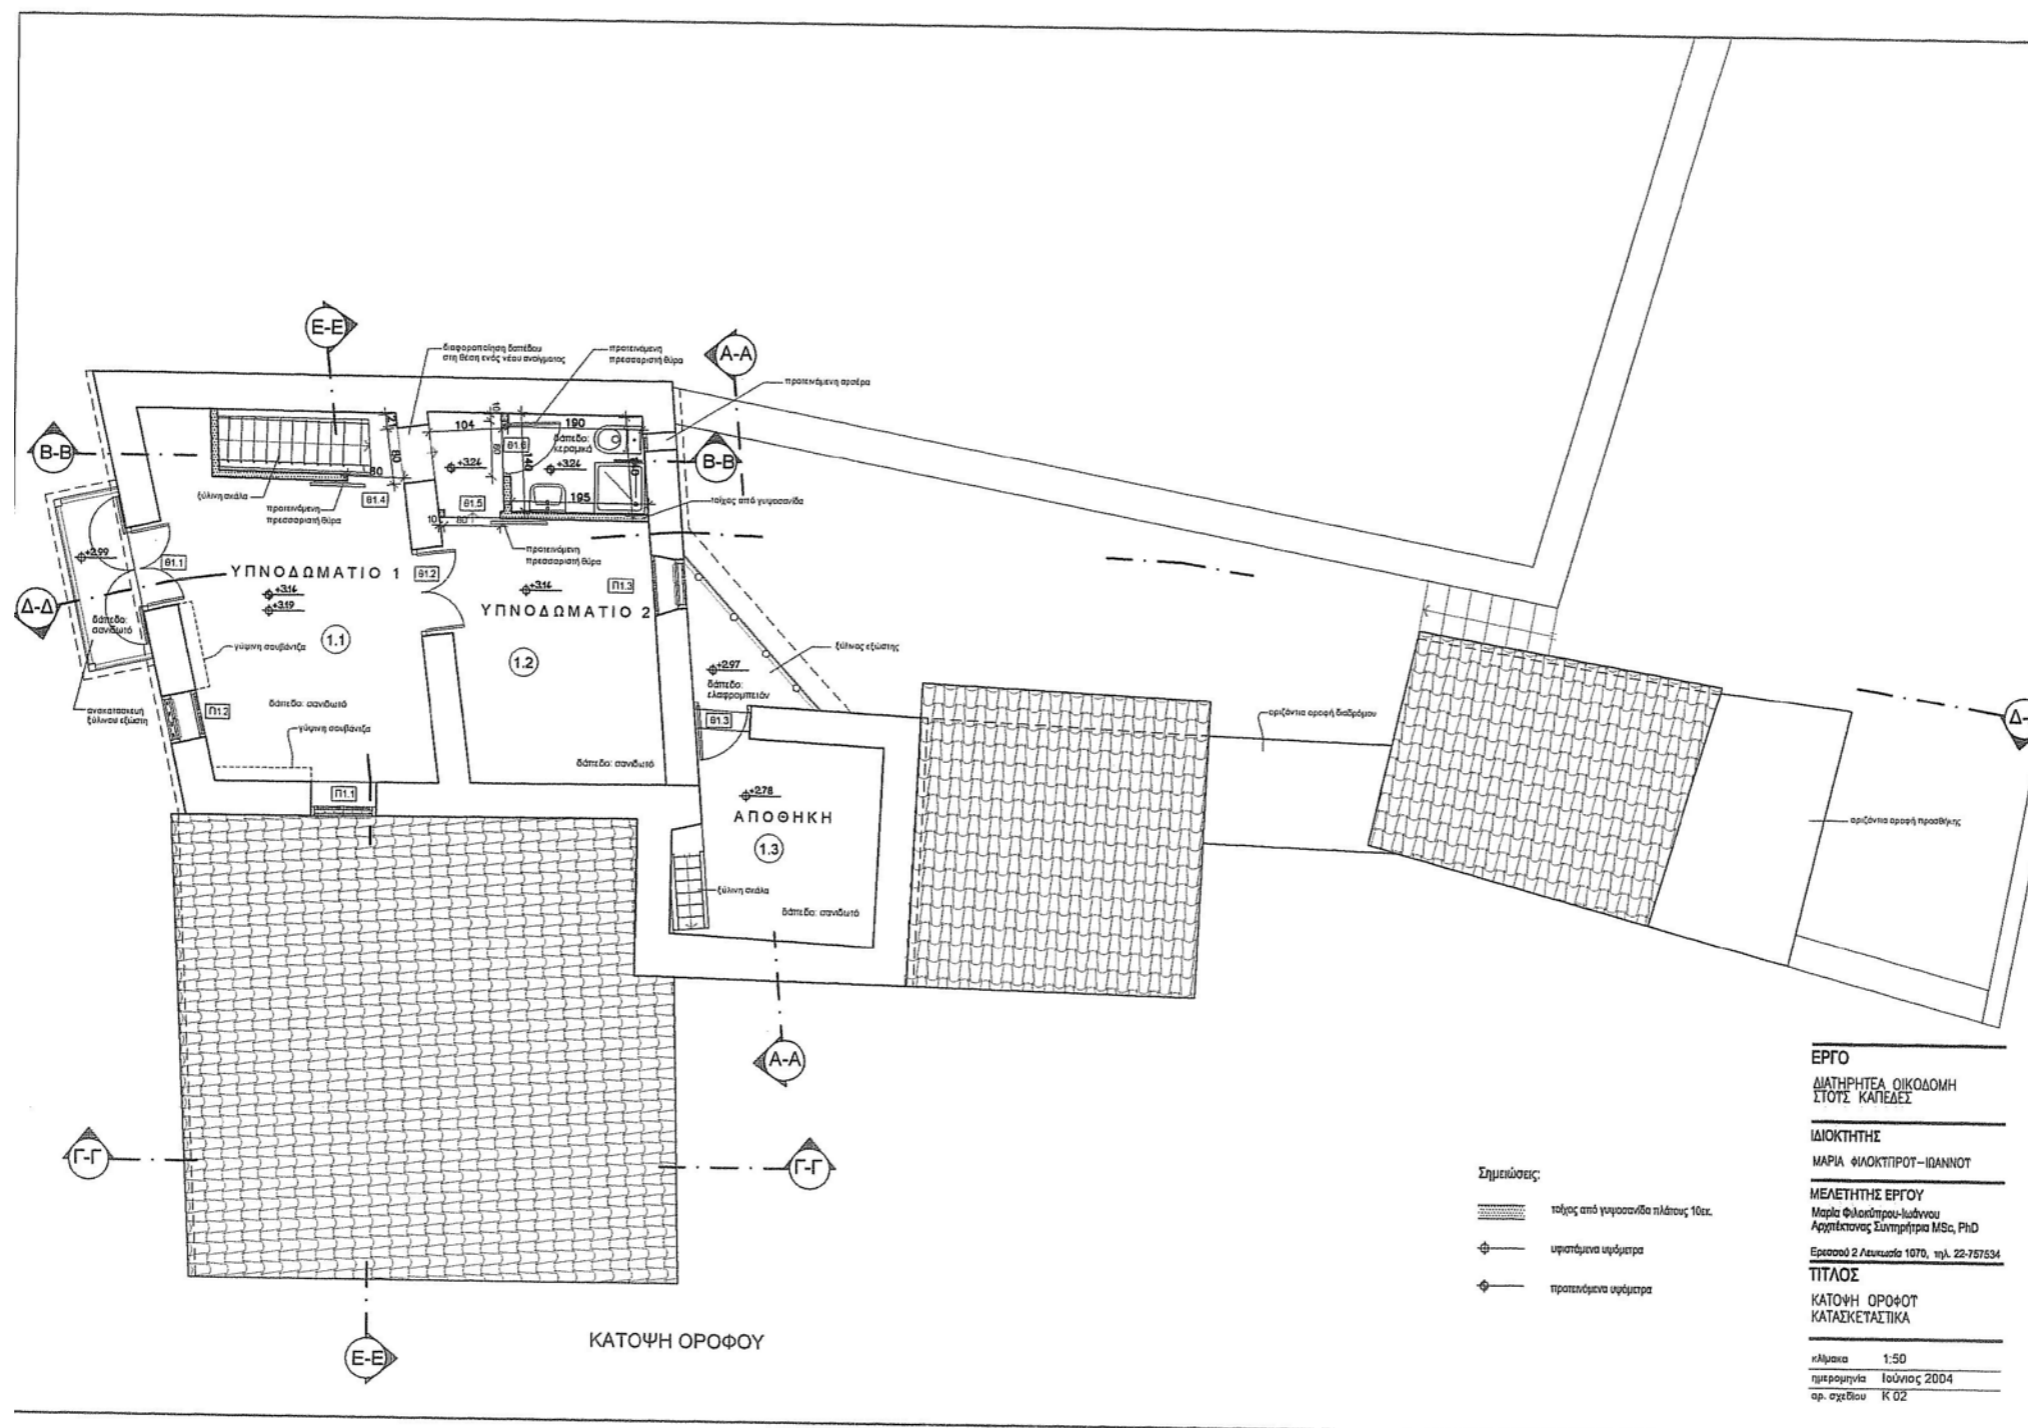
Plan of the first floor of the vernacular dwelling – Proposal for the restoration and reuse. © M. Philokyrou
